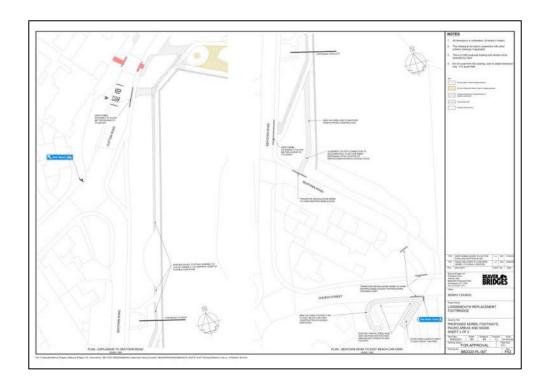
Proposed Infrastructure on Walking Route from East beach Car Park to the Proposed Bridge
